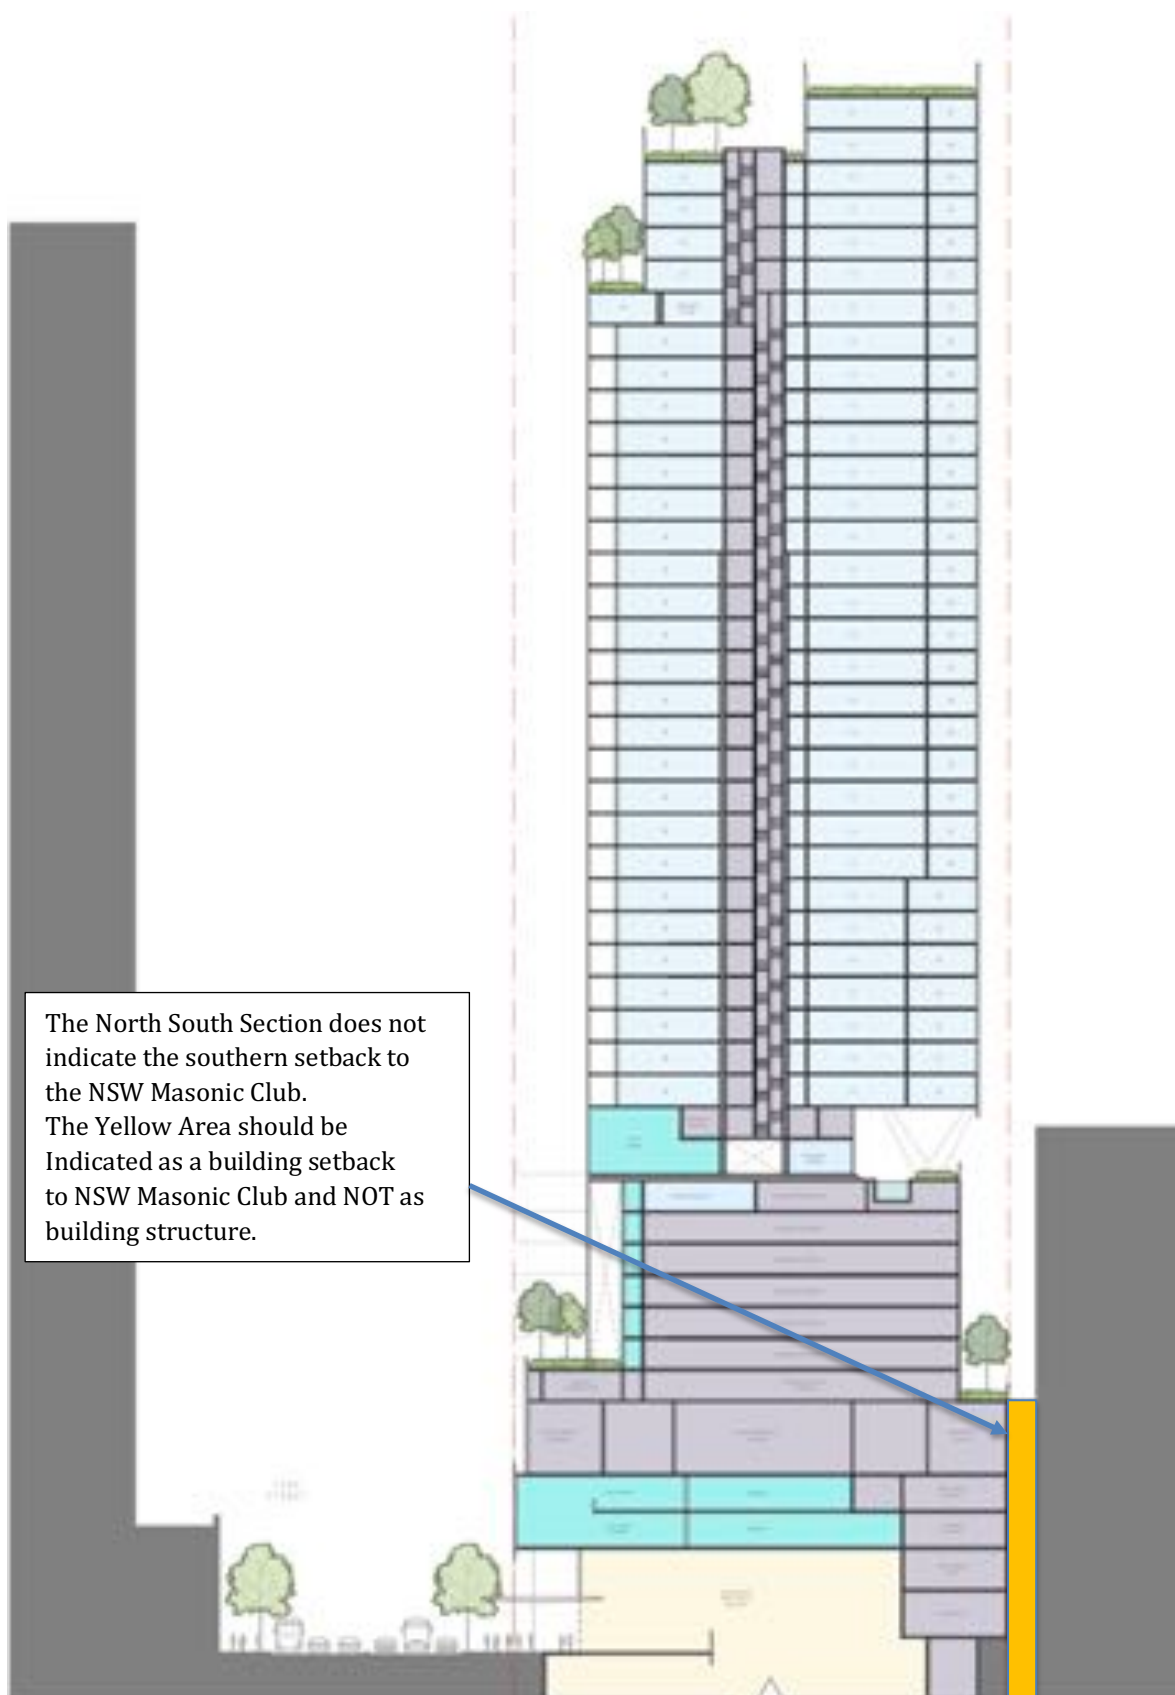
Indicative Scheme Drawings – North South Section- Pitt St. North OSD. NSW Masonic Club indicated with blue outline. Pitt Street North OSD Concept Application. Appendix F-Built Form and Urban Design Report. Architectus 2018.
